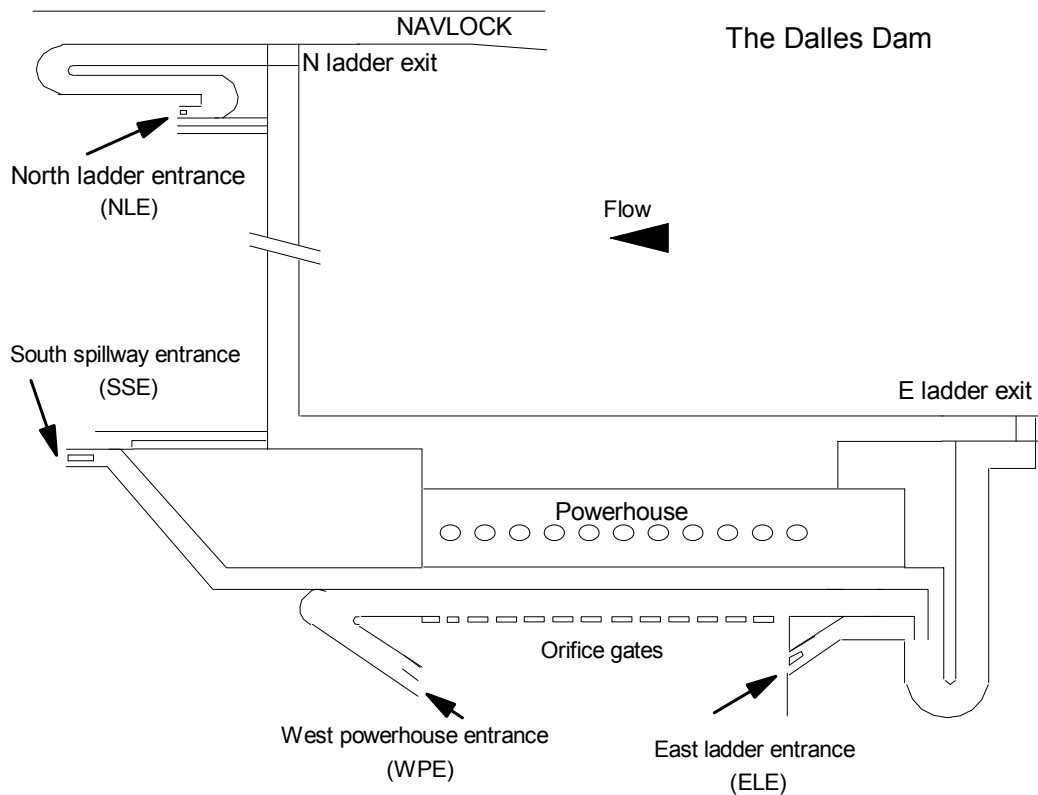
Locations of fishway entrances and ladders at The Dalles Dam.
